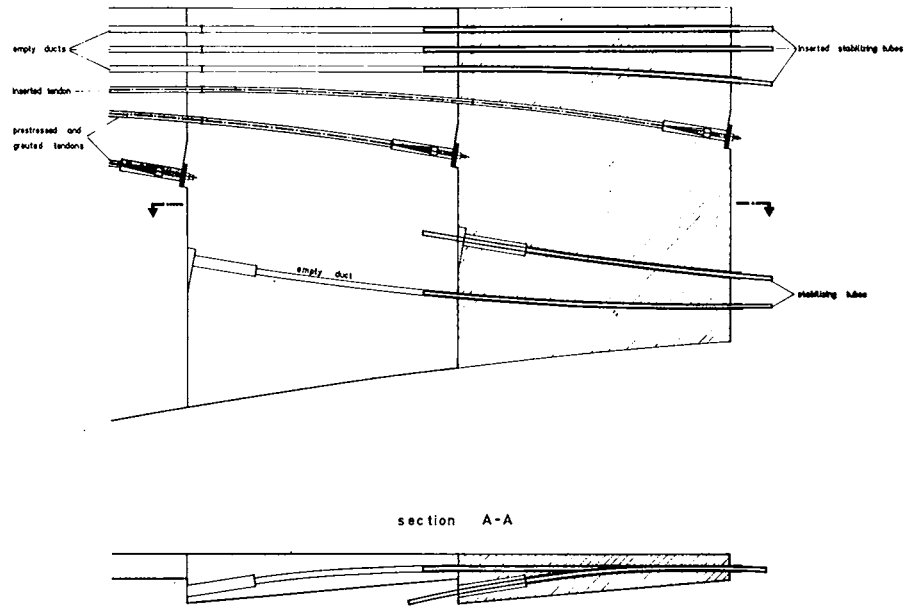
Tendon Arrangement of Bridge Crossing the Main Near Bettingen
